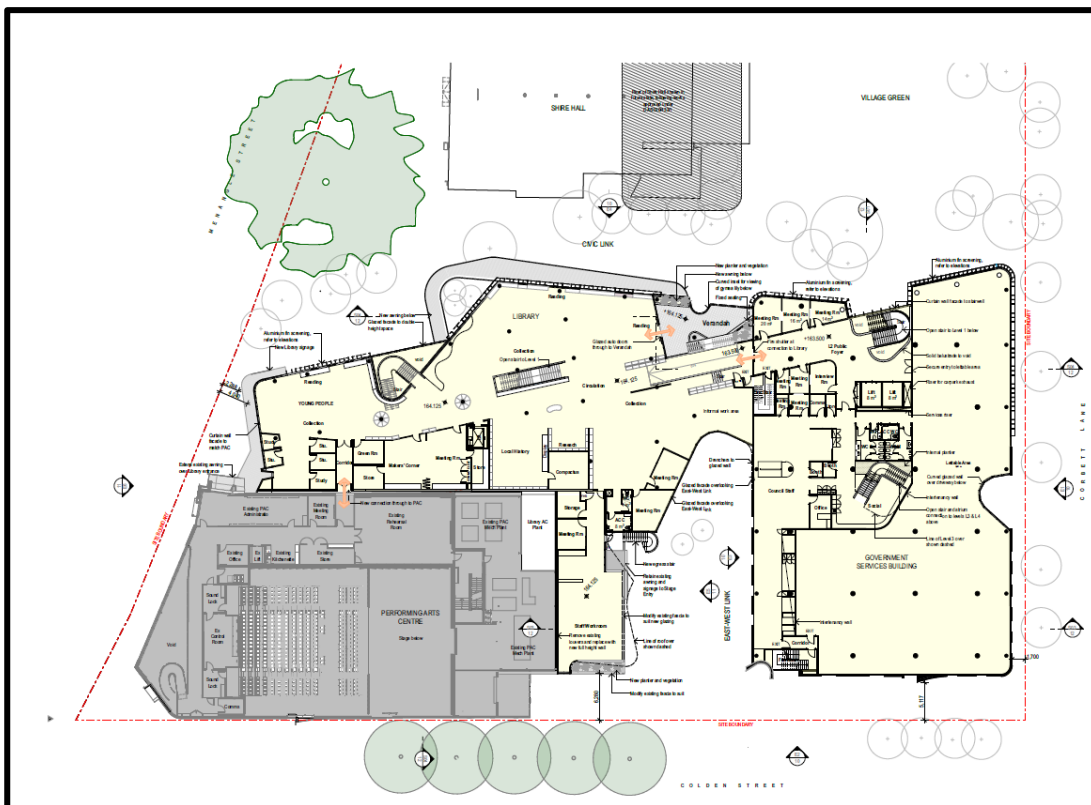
Proposed First Floor Plan (Source: William Ross Architects)
